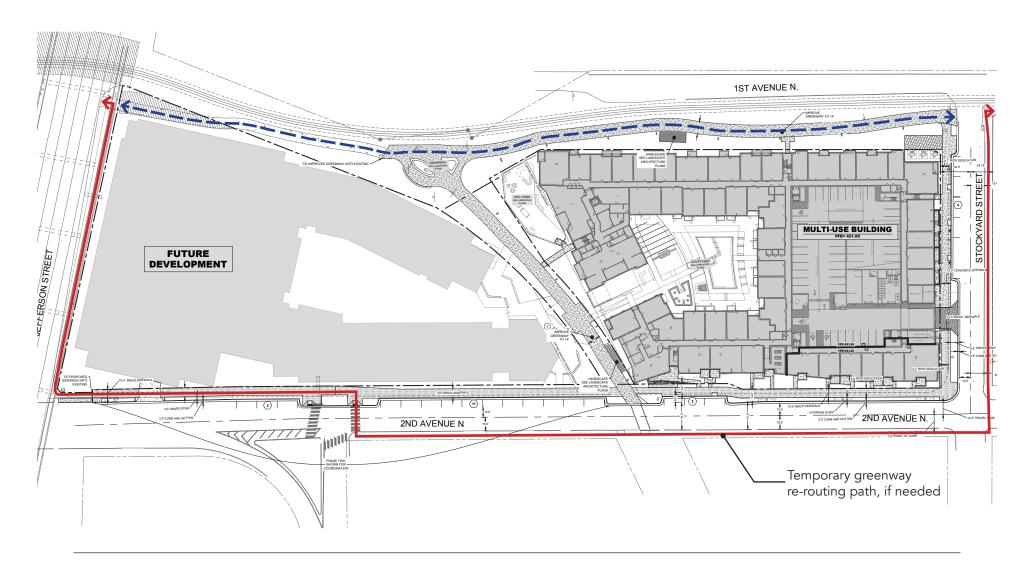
EXHIBIT G: GREENWAY RE-ROUTING PLAN
